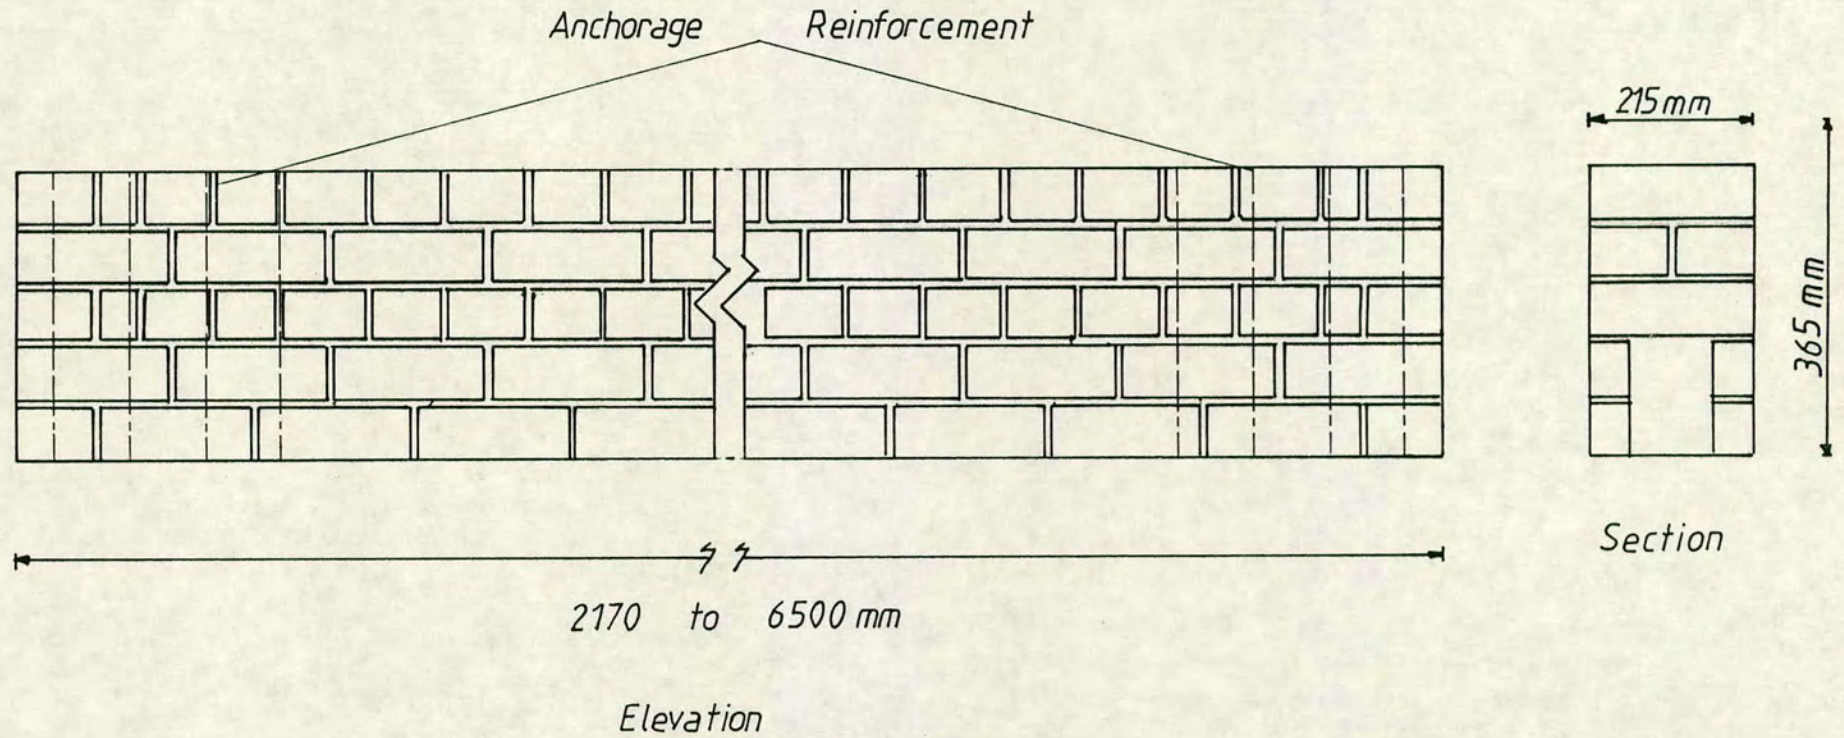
Beam Section and Elevation^{showing} the Coursing Pattern and Anchorage Reinforcement
